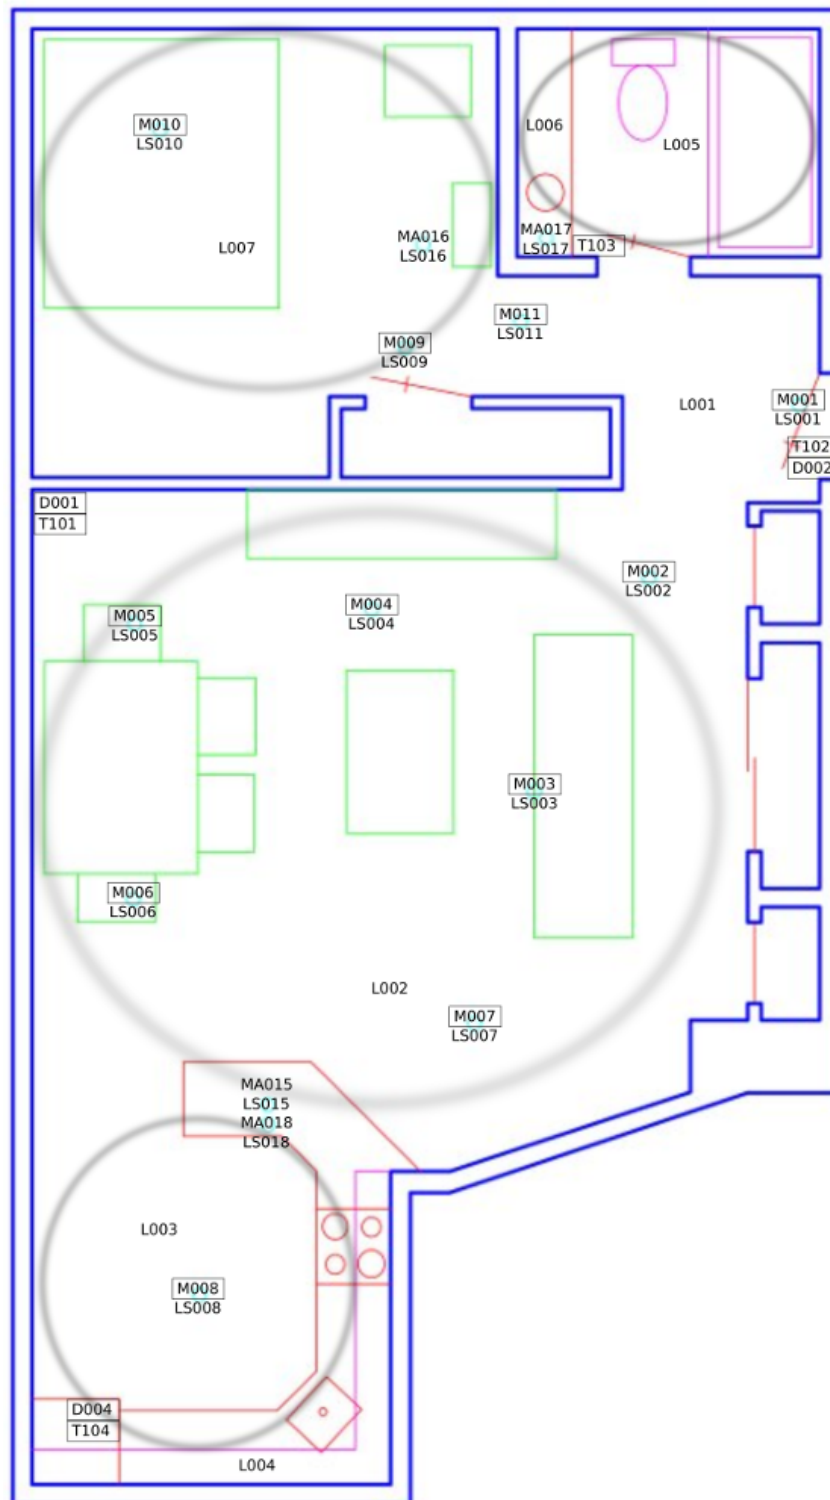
Floor plan and sensor placement for the testbed hh120.
